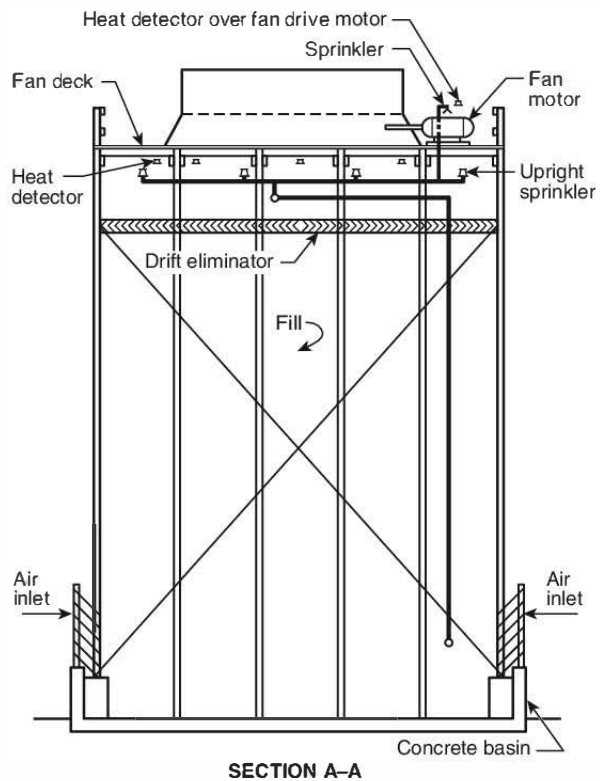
(d) Section View, Typical Deluge or Dry-Pipe Fire Protection Arrangement for Counterflow Towers.
